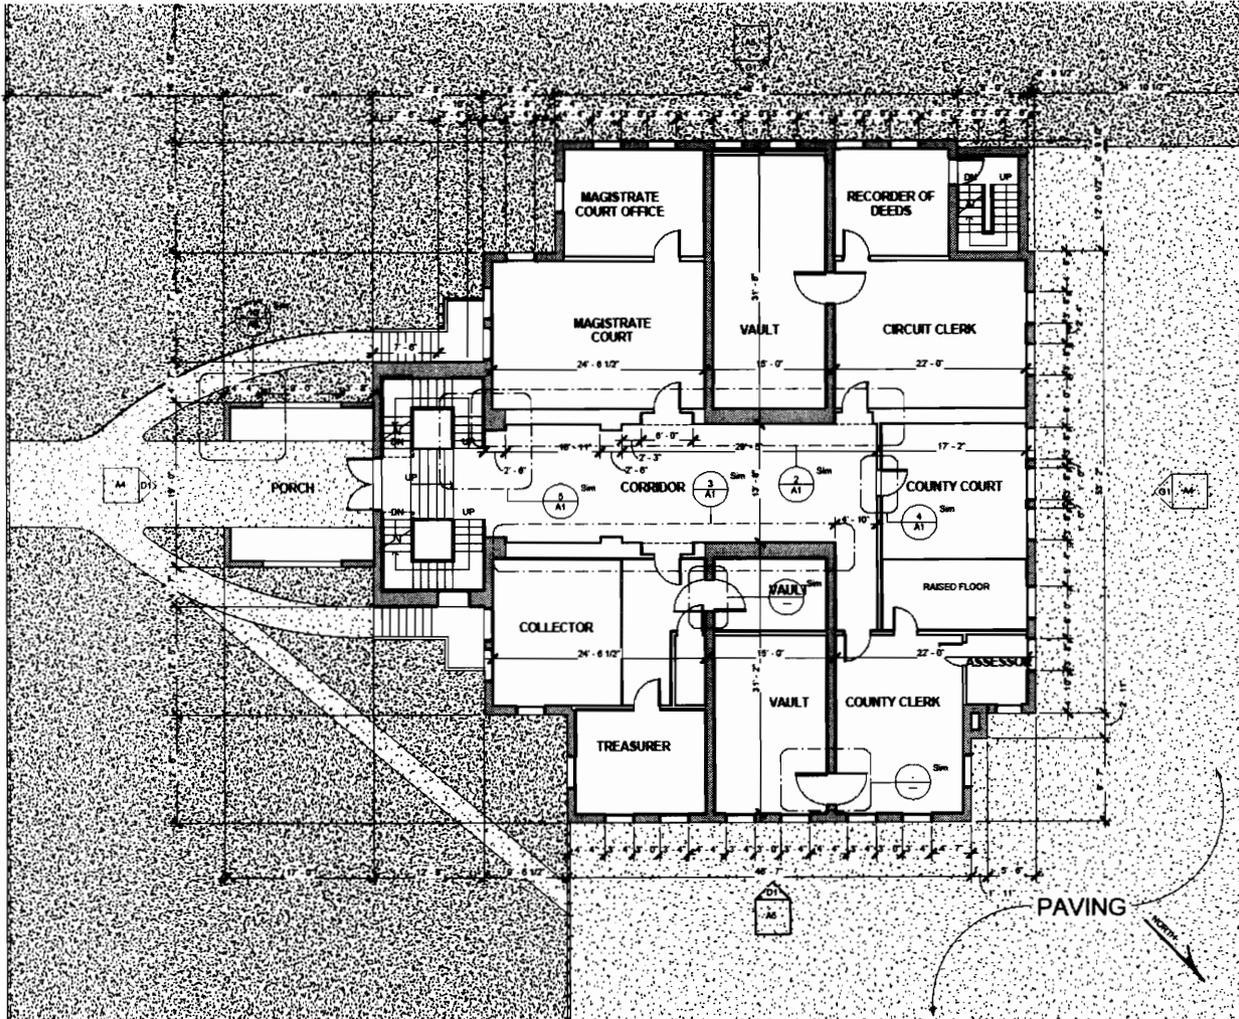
First Floor Plan, Washington County Courthouse, Tompkins Architects.
